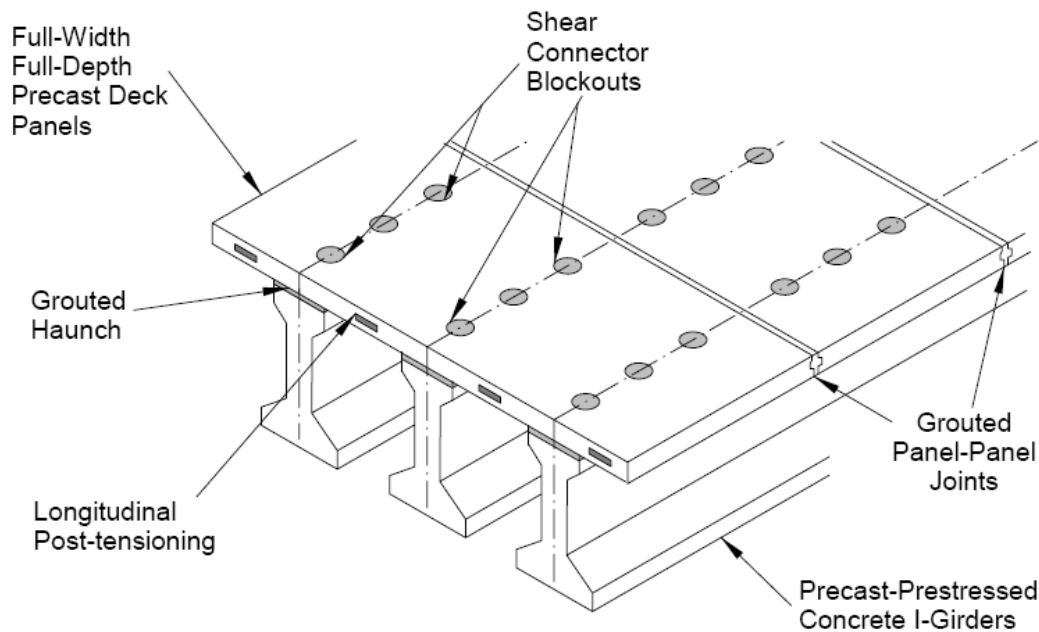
Precast Concrete Bridge Deck Panel System (Scholz, 2004)
